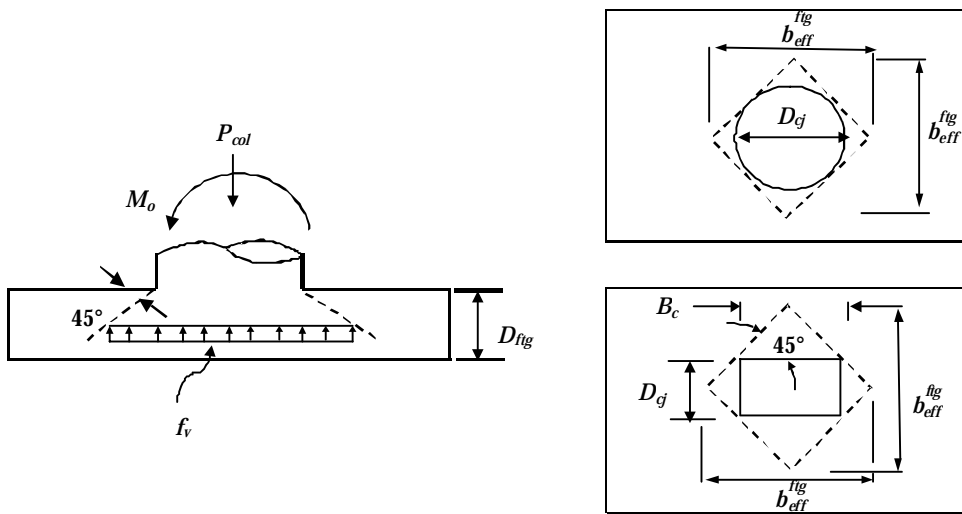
Effective Joint Width for Footing Joint Shear Stress
